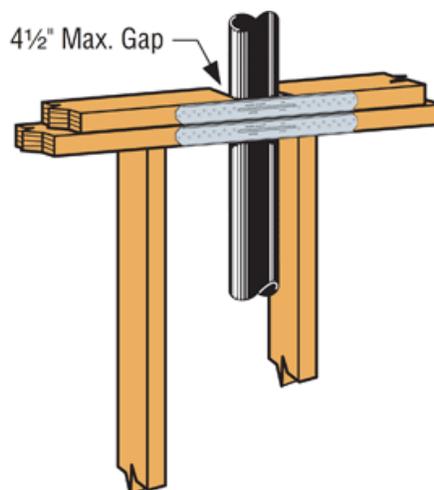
TYPICAL INSTALLATION OF CTS218 COMPRESSION/TENSION STRAP (TWO-STRAP, ONE-SIDED INSTALLATION SHOWN)
